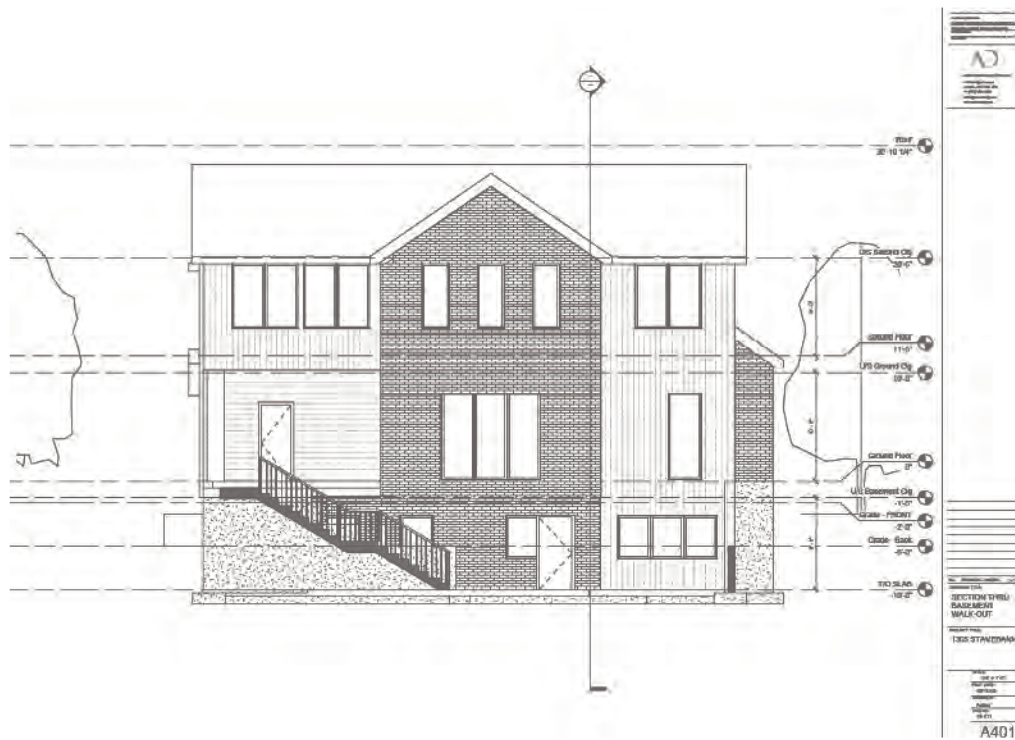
Proposed Section Thru Basement Walkout (AEON Design Studio, Inc., 2019)
